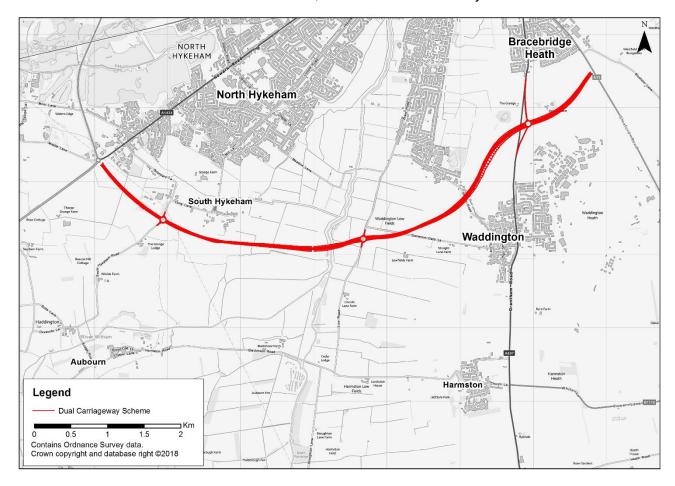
Alignment of Proposed North Hykeham Relief Road
